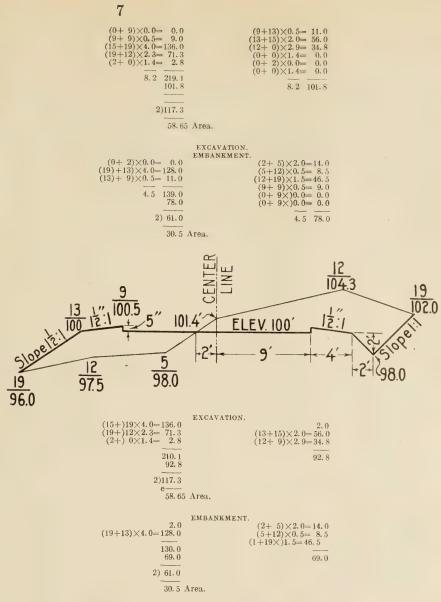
SHOWING METHOD OF COMPUTING AREAS OF EXCAVATION AND EMBANKMENT IN A SIDEHILL SECTION.
